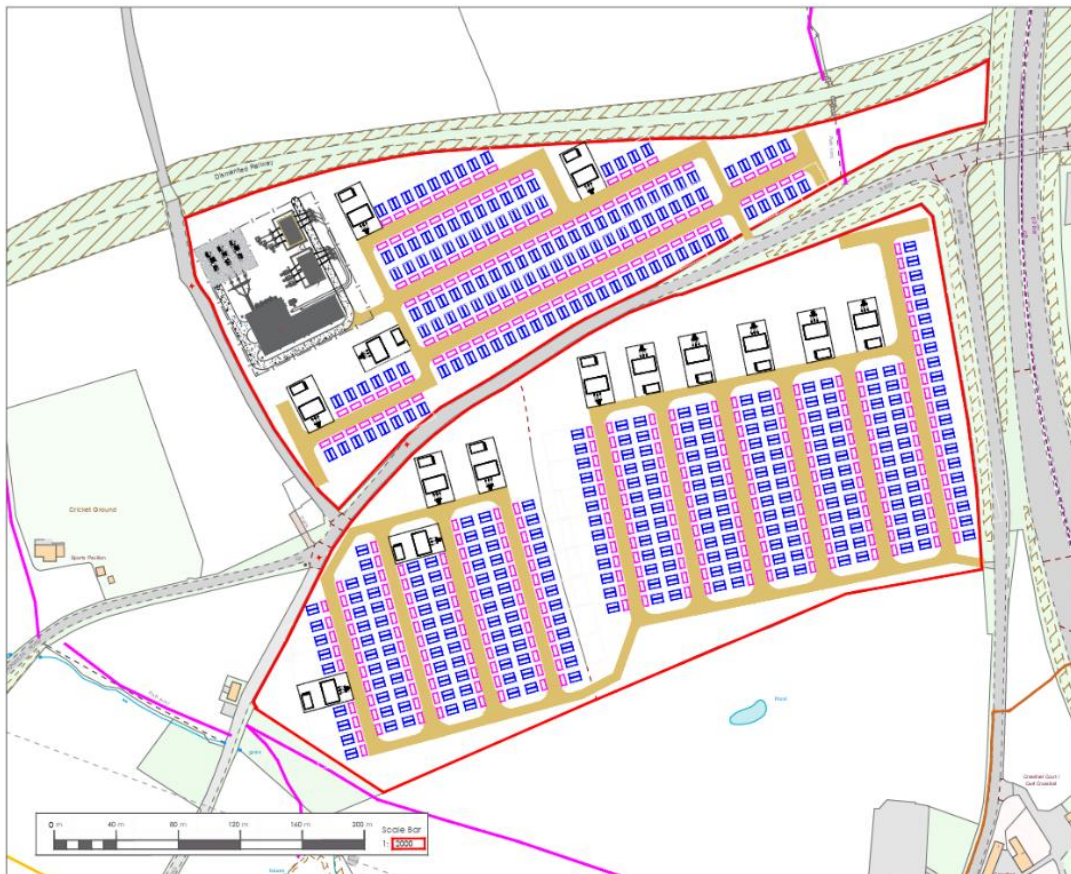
Previously Proposed Layout – Version 1 (March 2023)
